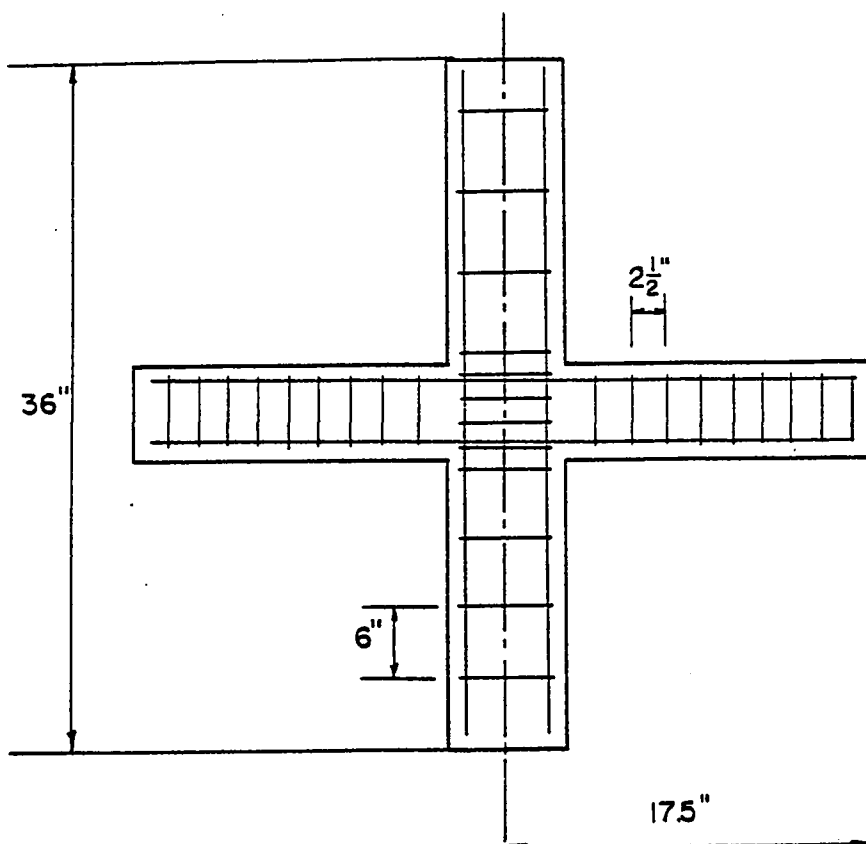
ELEVATION OF BEAM-COLUMN SHOWING ITS REINFORCEMENT
